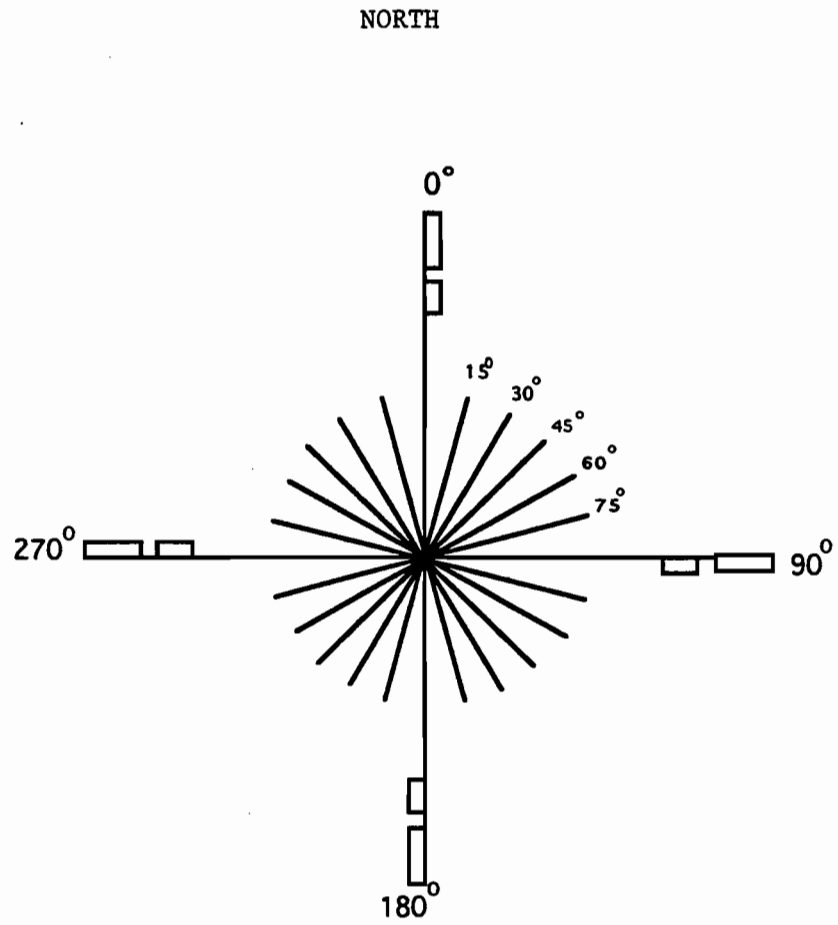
SIGNAL STRUCTURE FOUNDATION
